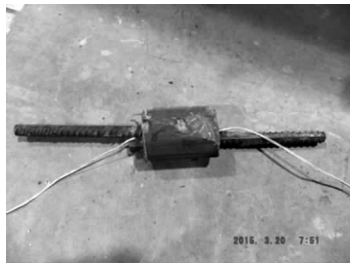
Failure modes of bar tensile failure of specimen 250-3
